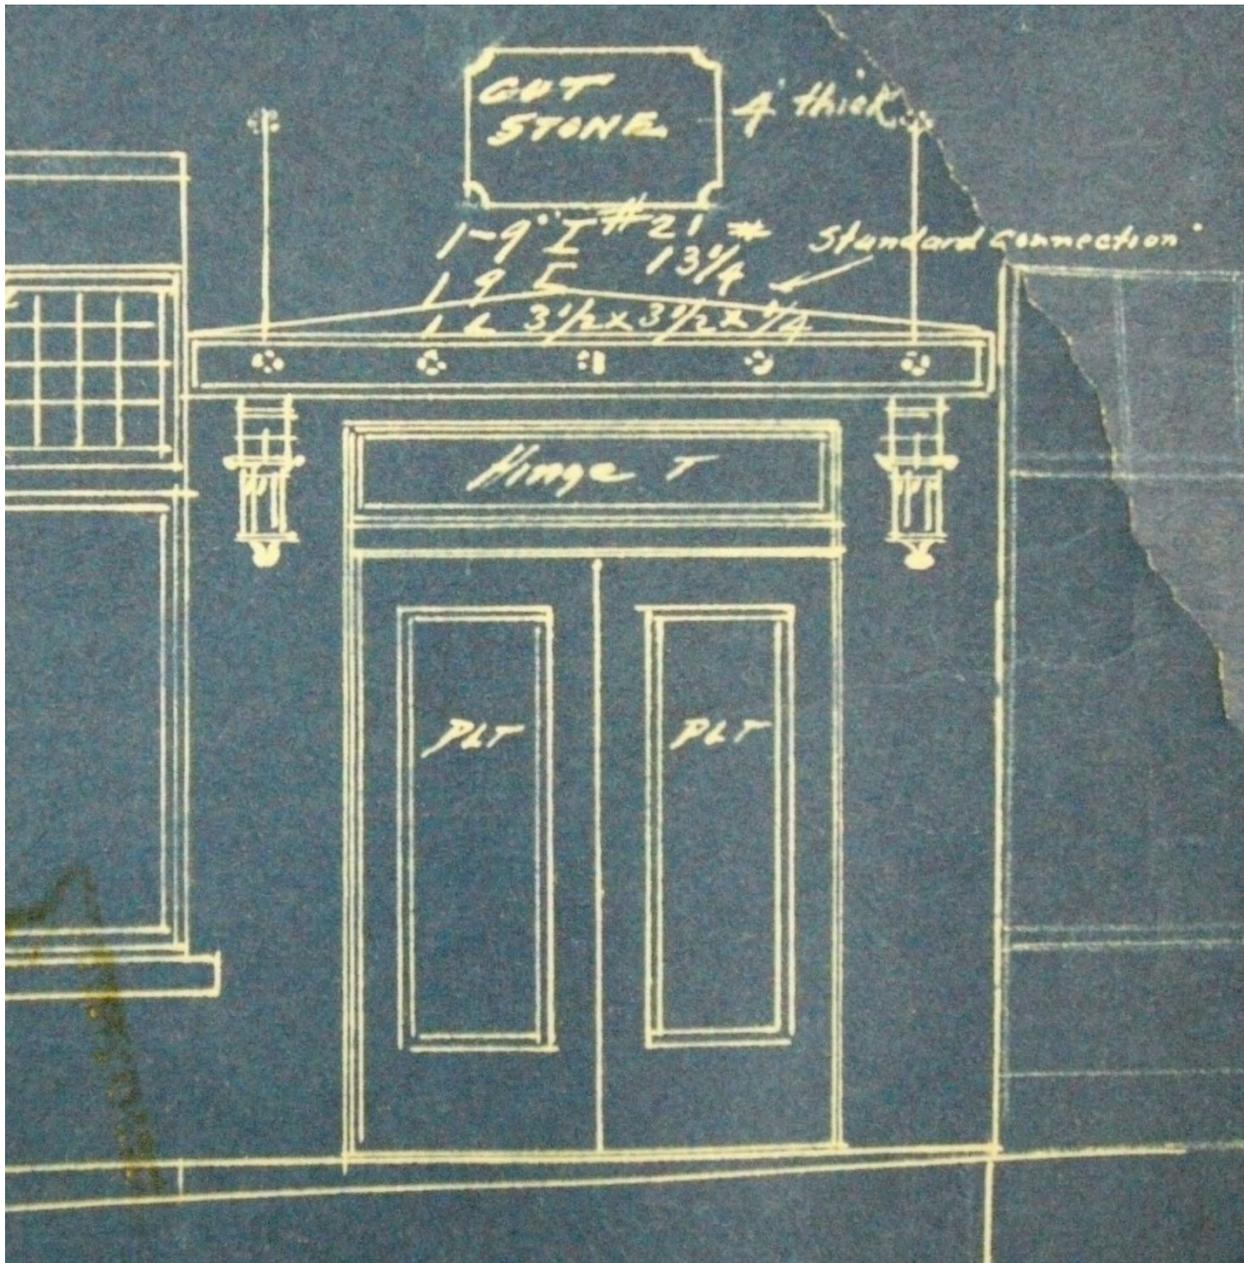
Lodge Hall entry front elevation, source: Northwest Architectural Archives
